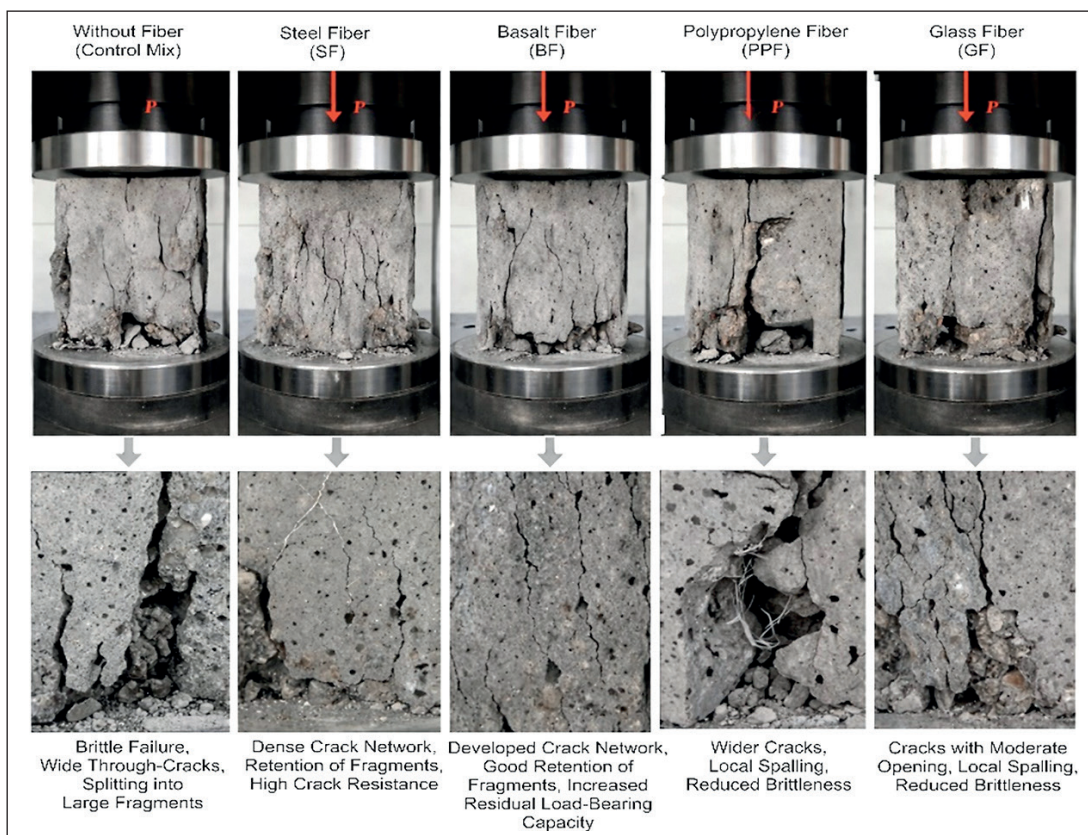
Failure patterns of concrete specimens with different types of fiber reinforcement under axial compression testing
